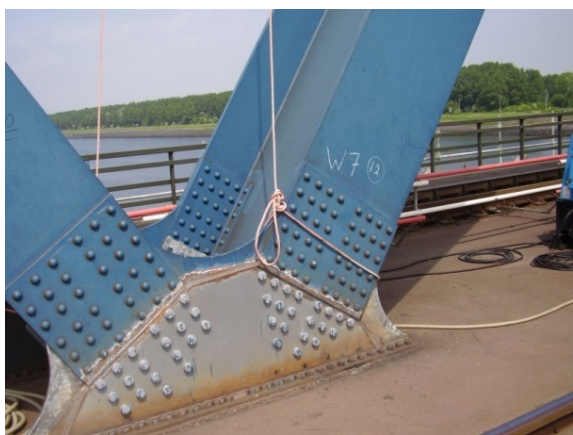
Strengthening the connection by a reinforcing plate, Caland Bridge [9]
